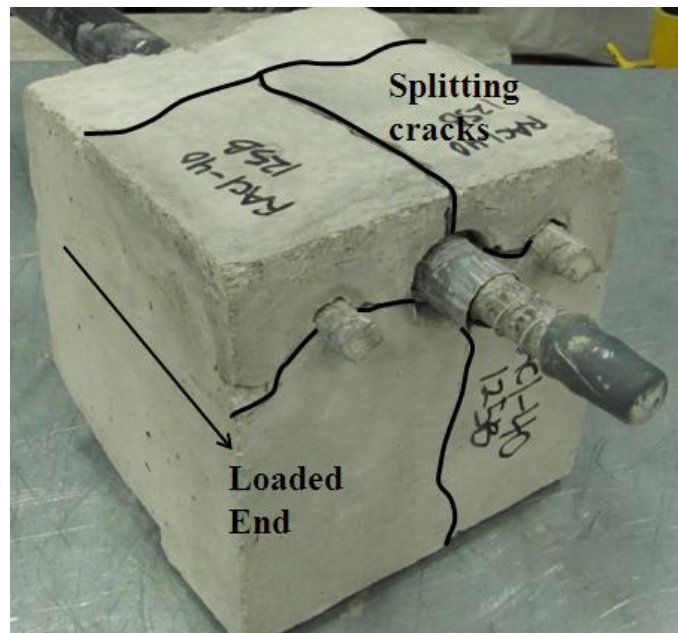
Main anchorage zone and splitting crack pattern (dissected BE-RAC1-40-125B)
